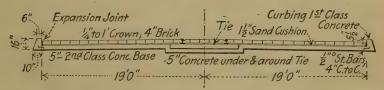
A. — Village Street, Brick Pavement. Tracks in center, "T"-Rail Special Grooved Brick
